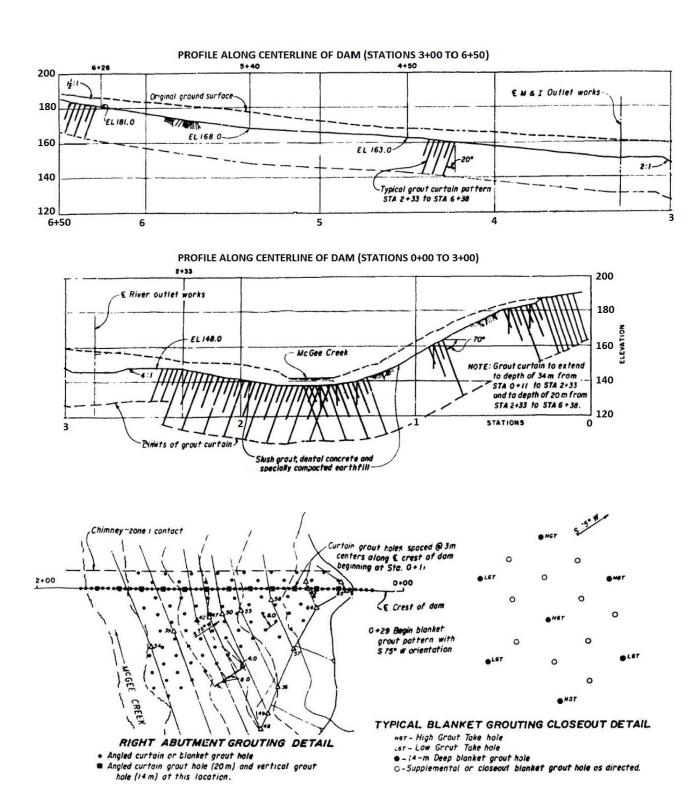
Section view of original grout curtain design at McGee Creek Dam
